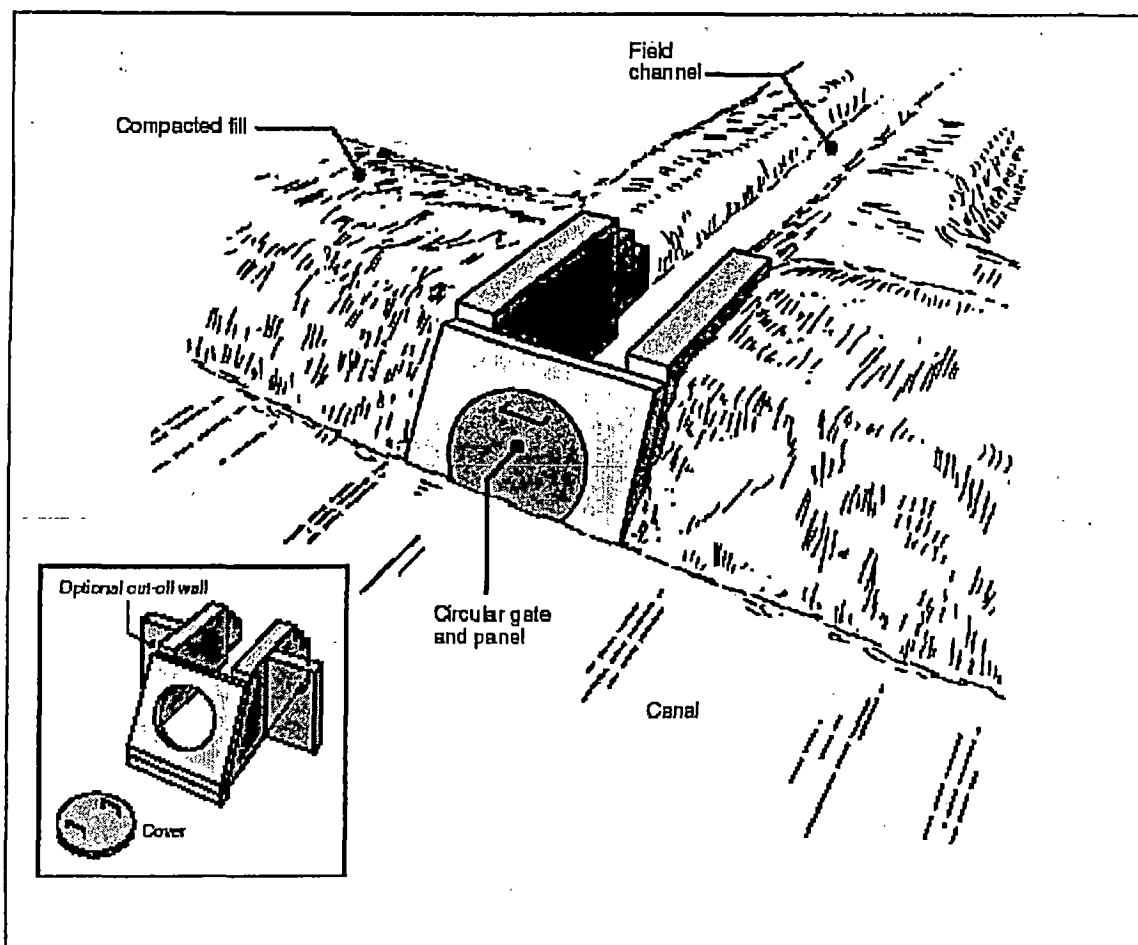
Pre-cast concrete circular gate and Panel with outlet structure
